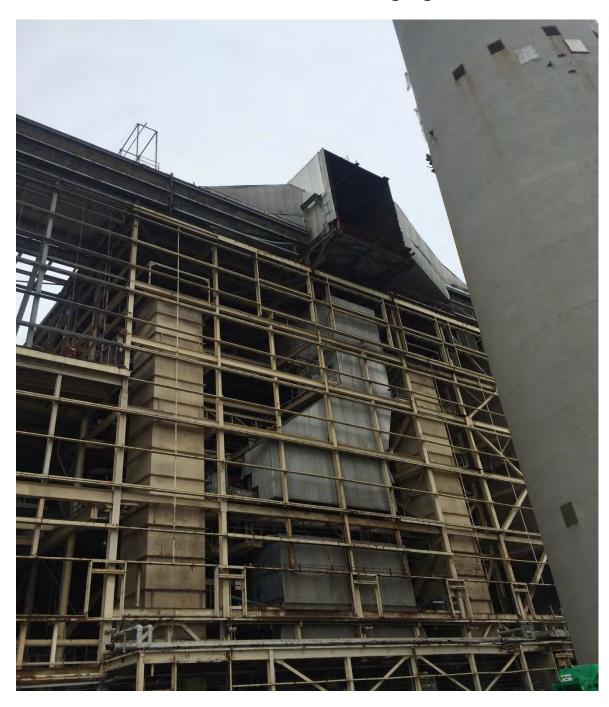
Encina East Wall Roof Demo "Peel Off" ongoing.
